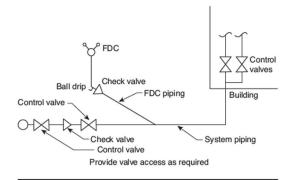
(b) Fire Department Connection to Underground Piping for Multiple Systems.
